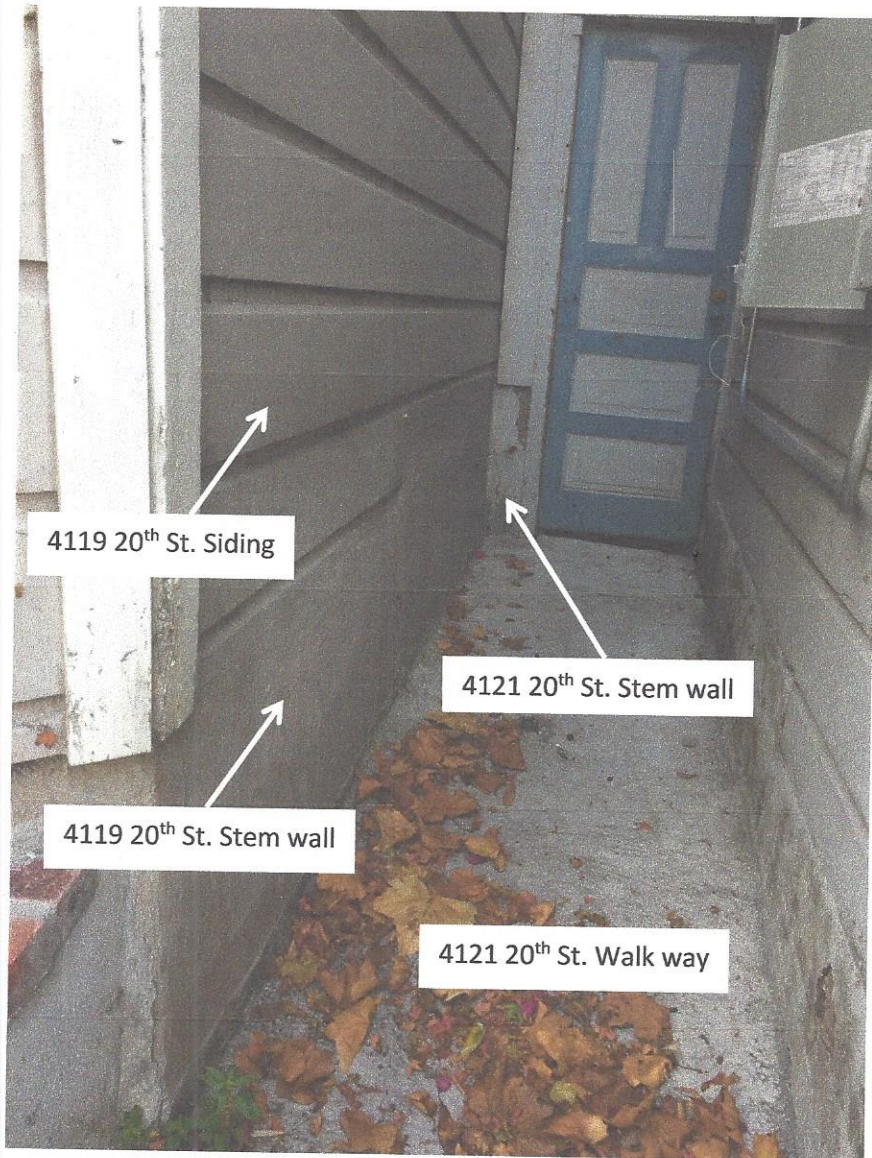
indicates footing is lower than 4121 20th St. Walkway. Proposed basement finish elevation is 2 feet lower than walkway elevation.
